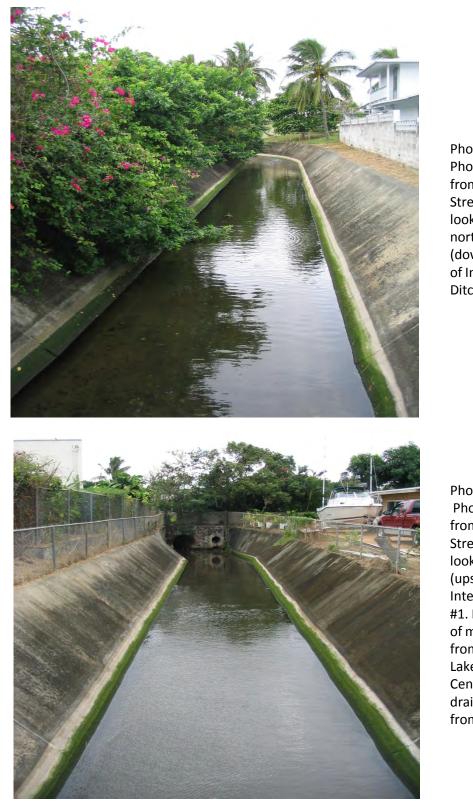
Photo taken from Alahaki Street Bridge looking northwest (downstream) of Interceptor Ditch #1.
